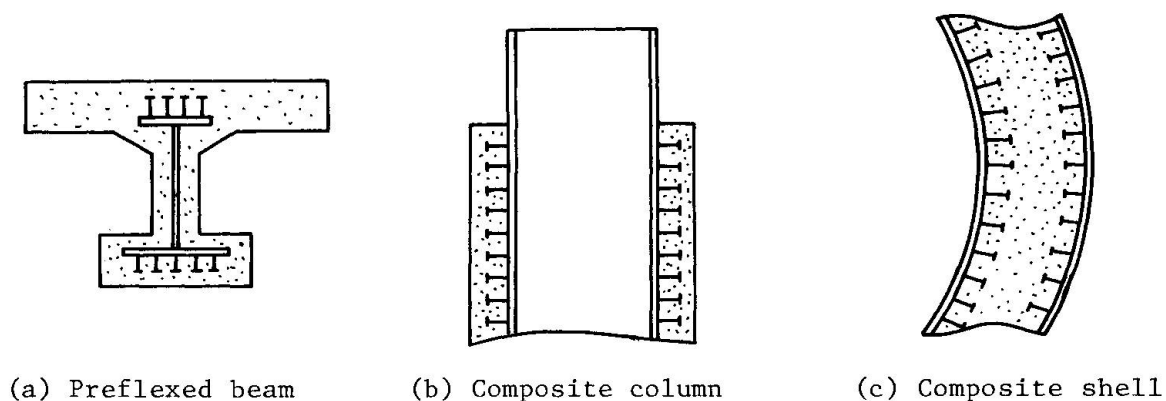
Applications of stud shear connectors in various steel-concrete composite constructions
